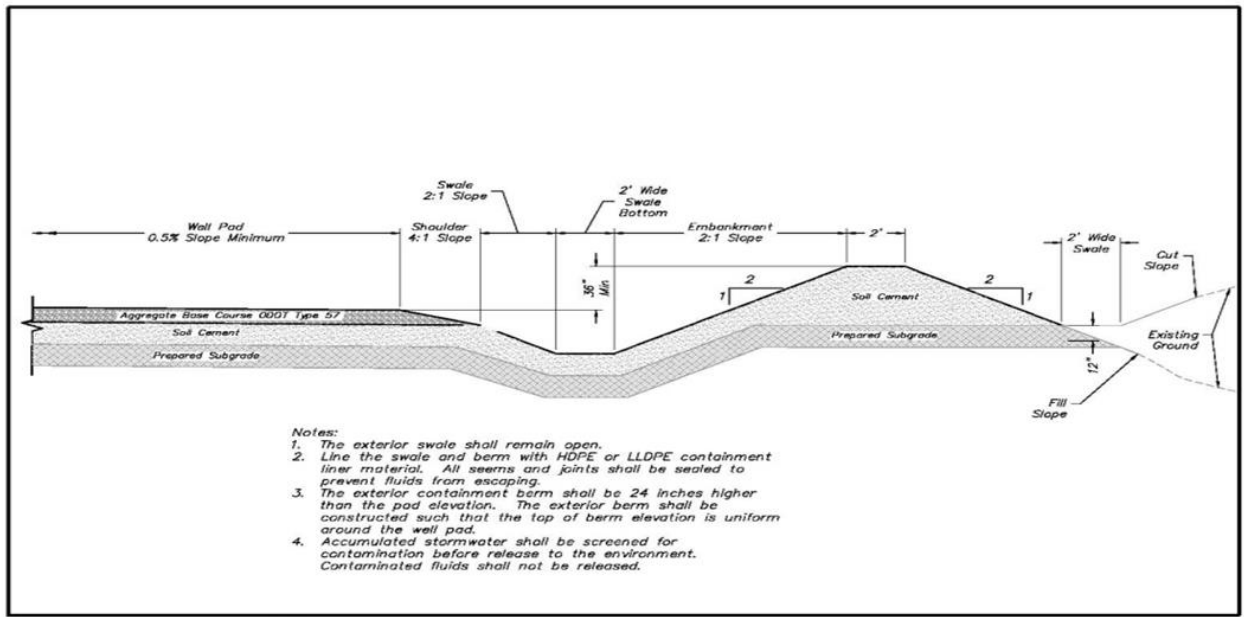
EXTERIOR BERM AND PERIMETER DRAIN TYPICAL SECTION
